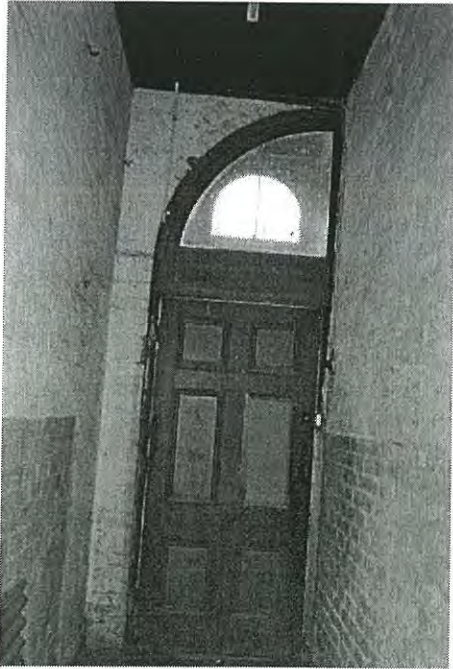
Interior, Passage (space T03). Note original brick walls (now painted) and six panelled timber door. The door appears to reveal an original/early colours scheme.
